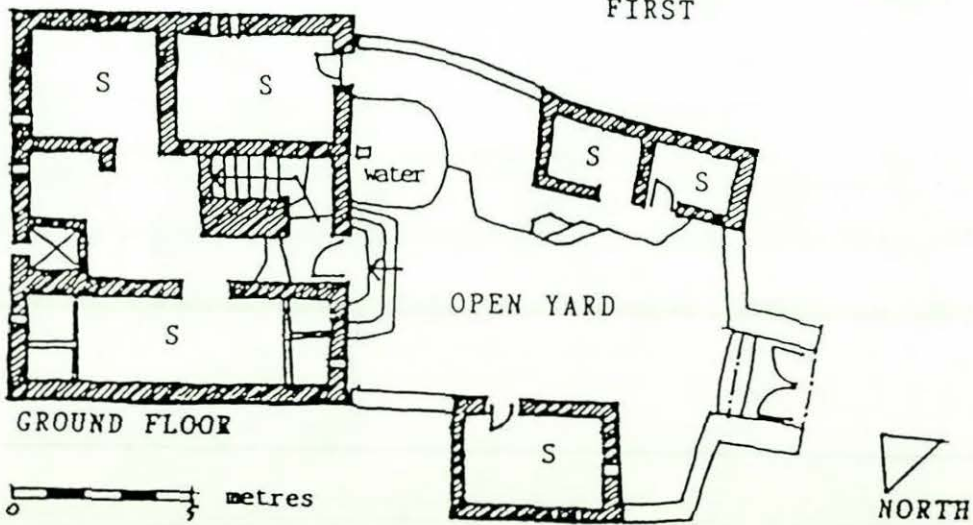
Layout plan for a traditional rural house in north Yemen
